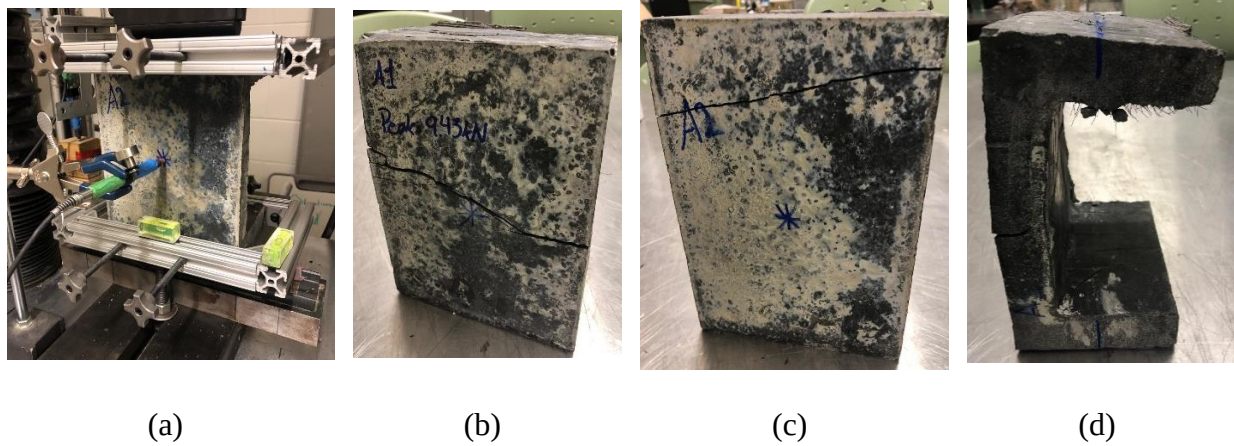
C-Shaped UHPFRC Jackets (a) setup and (b), (c) & (d) after flexure testing.
